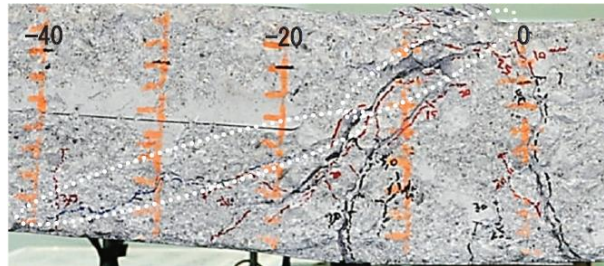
Cracking patterns at failure stage of beam “T” by test
